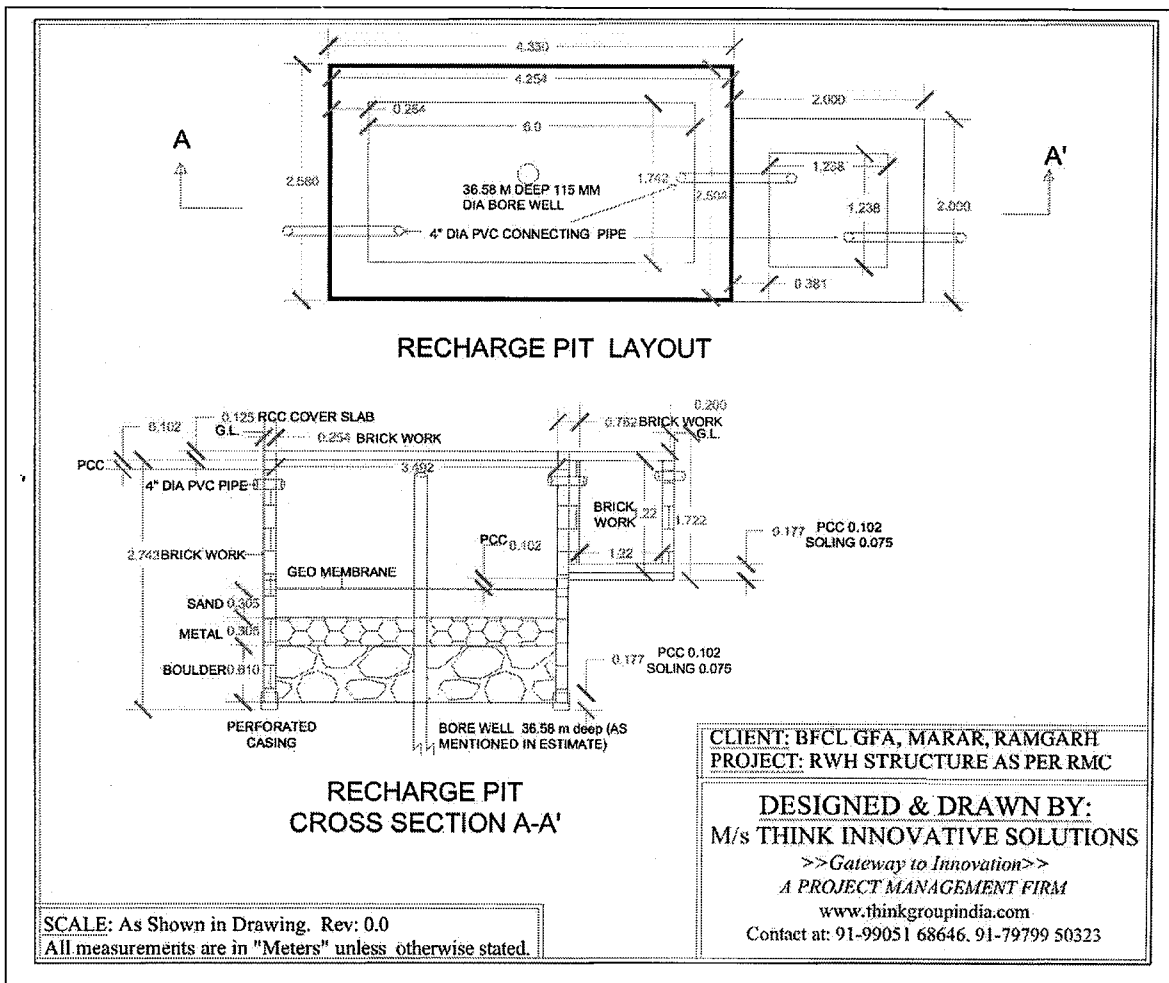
LAYOUT AND CROSS SECTION OF PROPOSED RWH STRUCTURE
